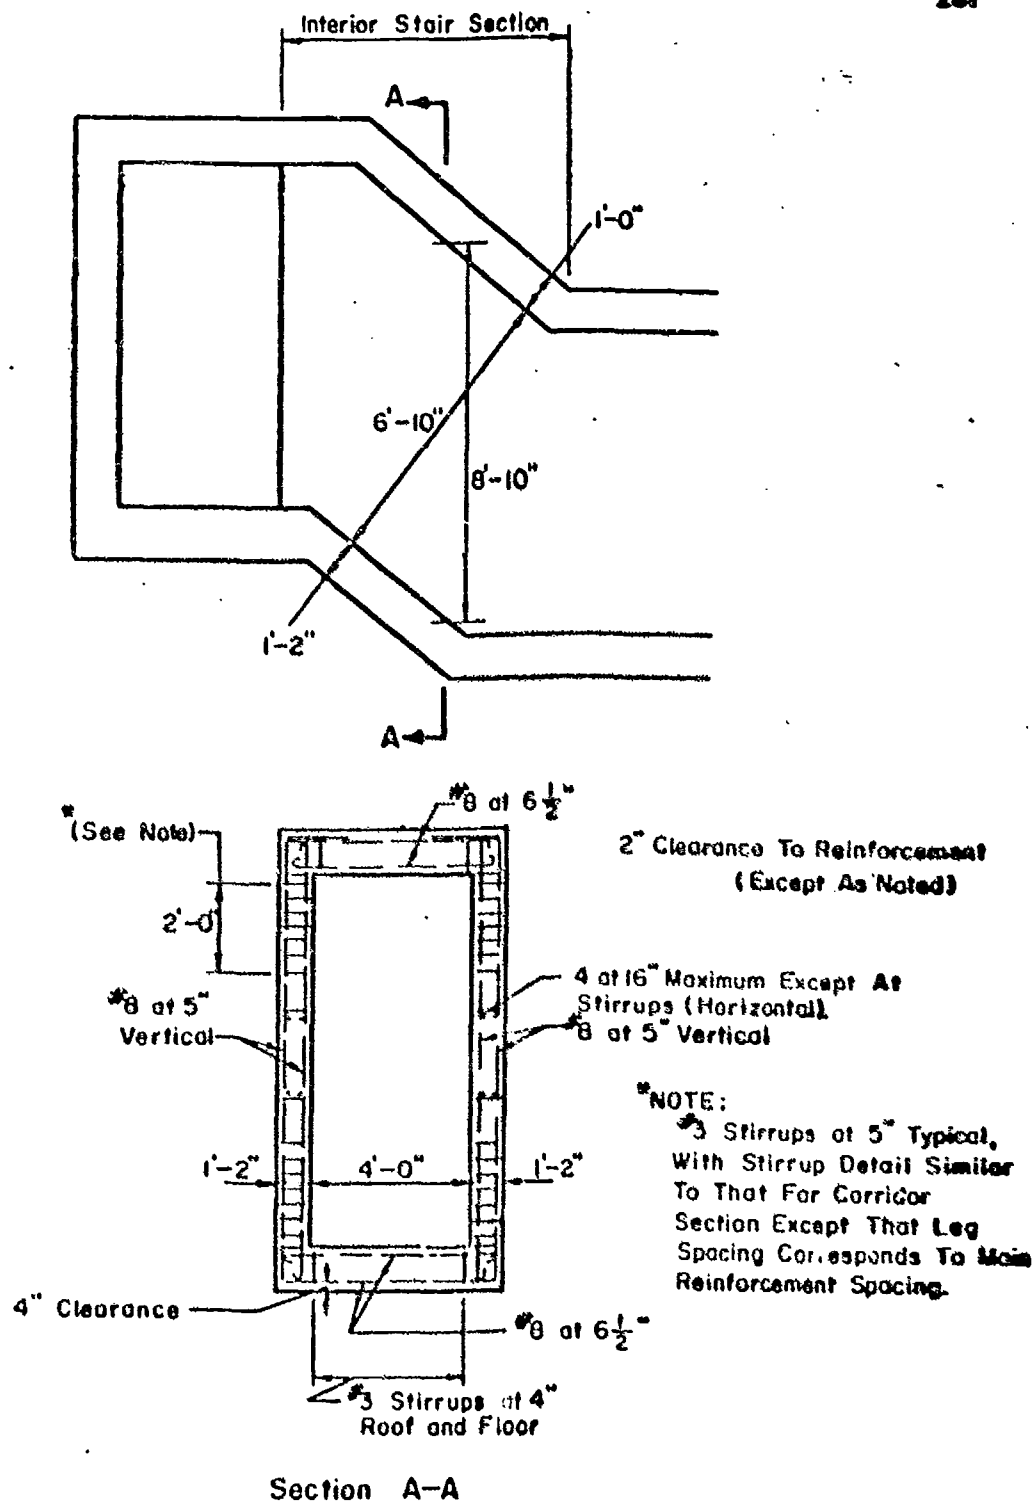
REINFORCEMENT IN INTERIOR STAIR SECTION
